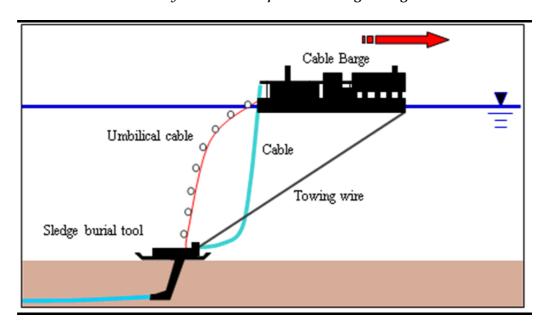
Equipment for Simultaneous Cable Lay and Burial Operation using "Sledge Tool" or "Injector Tool"
